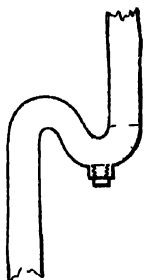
Siphon sink-trap with movable screw for cleaning.
